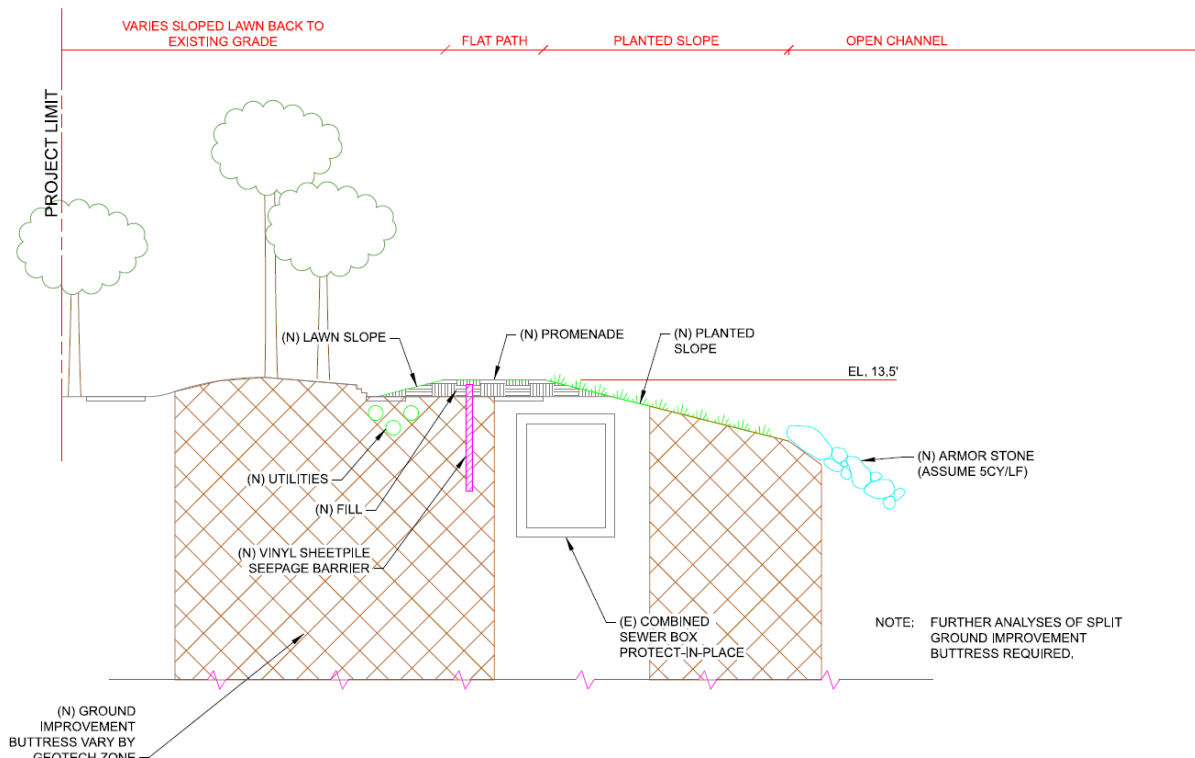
Section 7 Recommended Plan (Reach 3, Mission Creek North)
